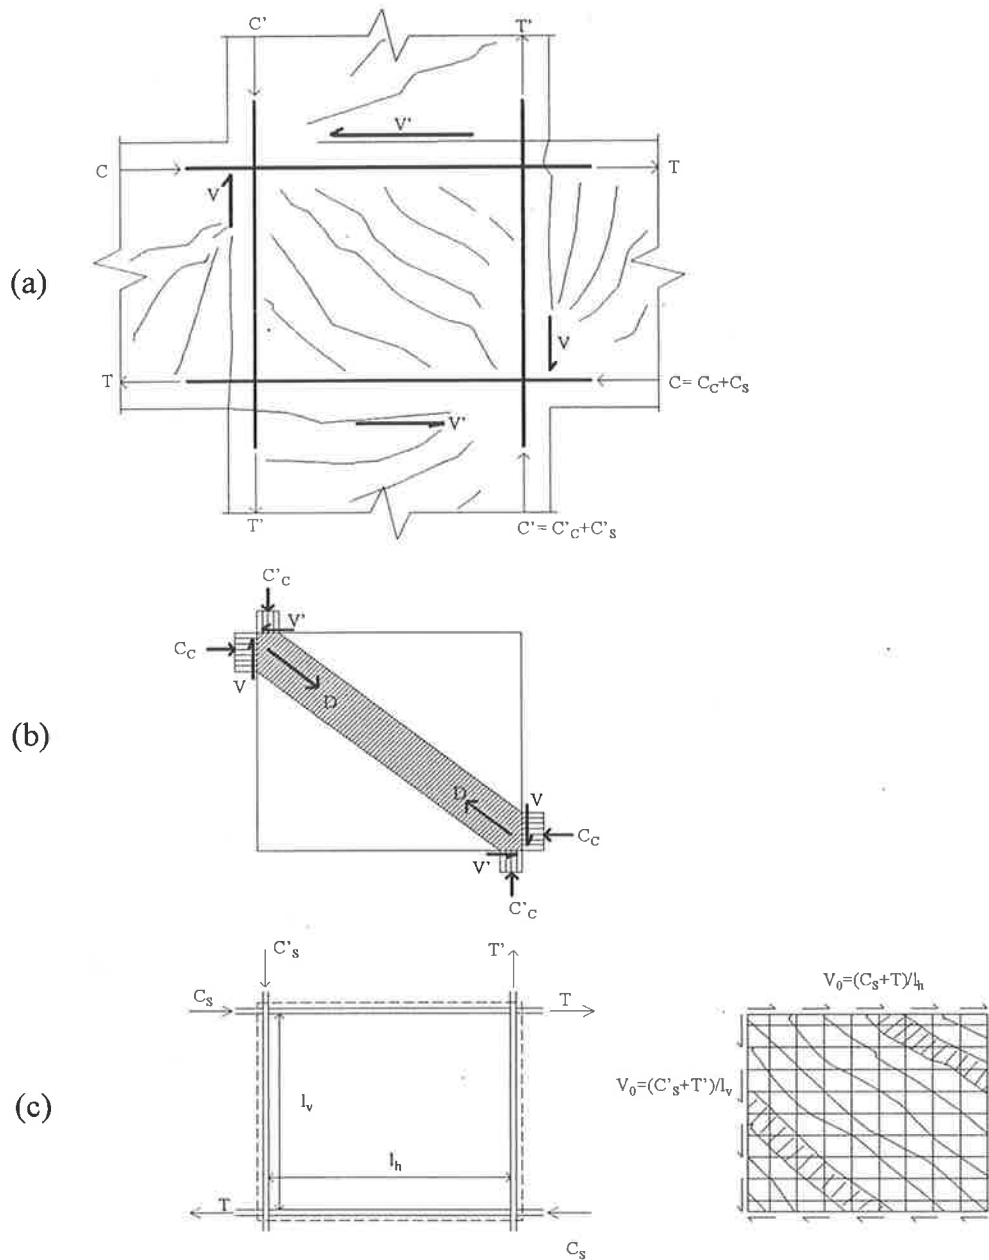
Mechanisms of Shear Transfer of Reinforced Concrete Beam-Column Joint Core: (a) Forces acting on a beam-column joint core; (b) Shear transfer by diagonal compression strut; and (c) Shear transfer by truss action of shear reinforcement (after Park and Keong [14])
